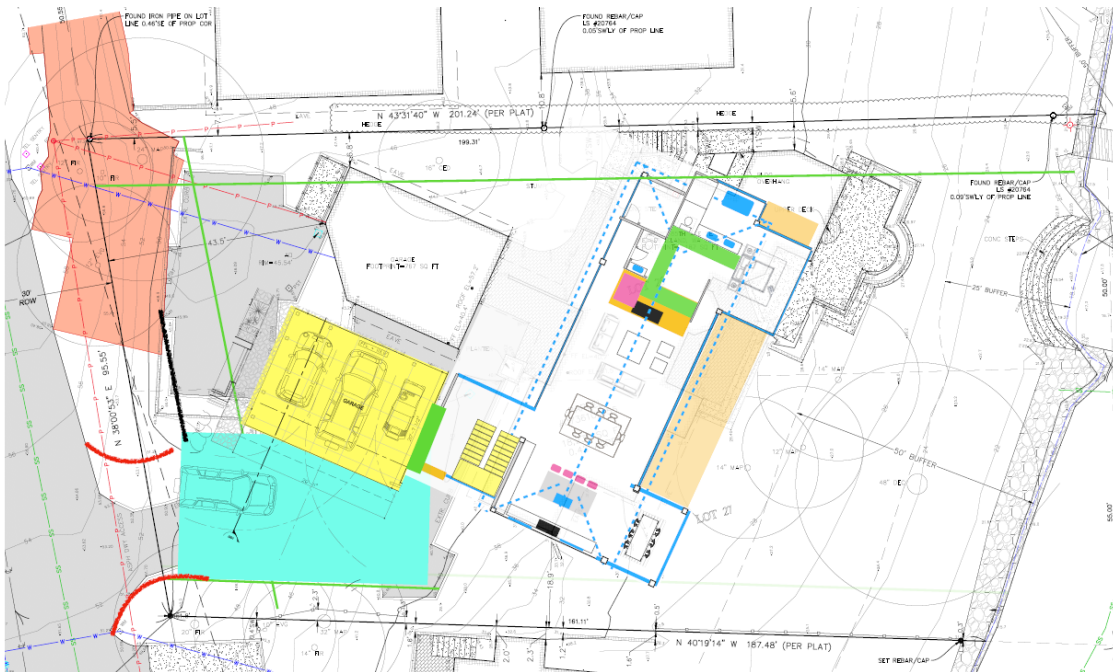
Excerpt from the plan set showing the proposed layout of the new home hardscaping. The existing sport court and garage are to be removed and the area brought back to pre-original construction grade.
